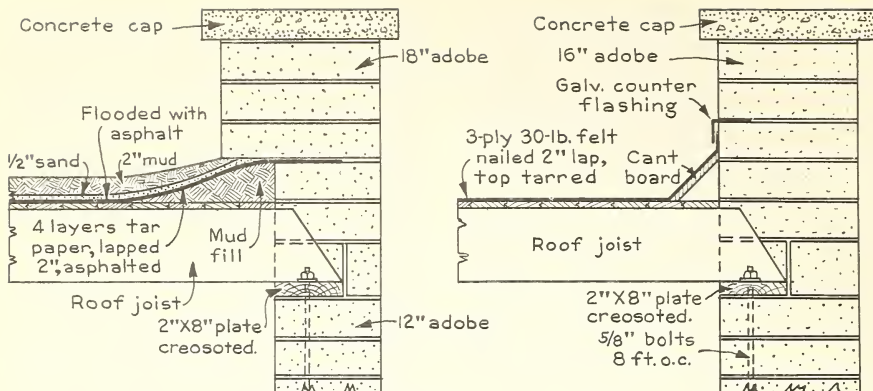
Two methods of building flat roofs on earth-block buildings.
